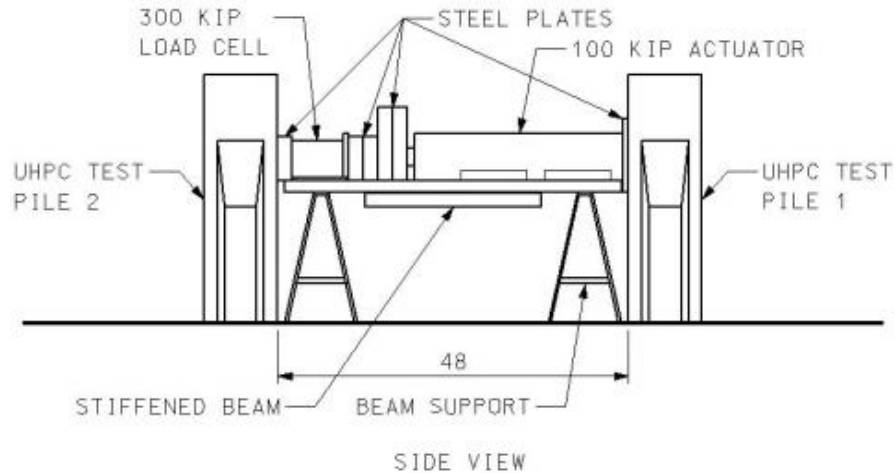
A view of lateral load test setup used for the UHPC piles
